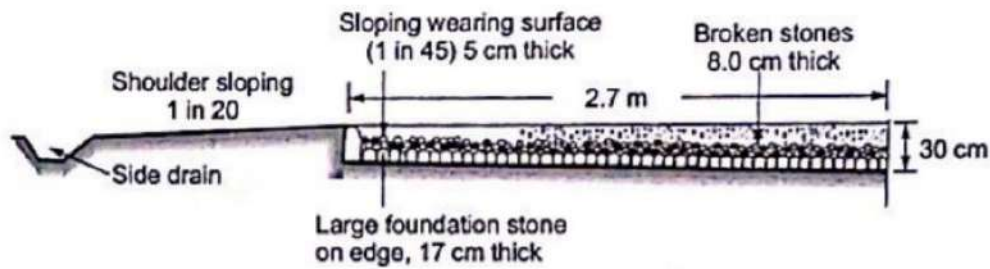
Tresagut road construction (Highway Engineering by: Khanna and Justo)
